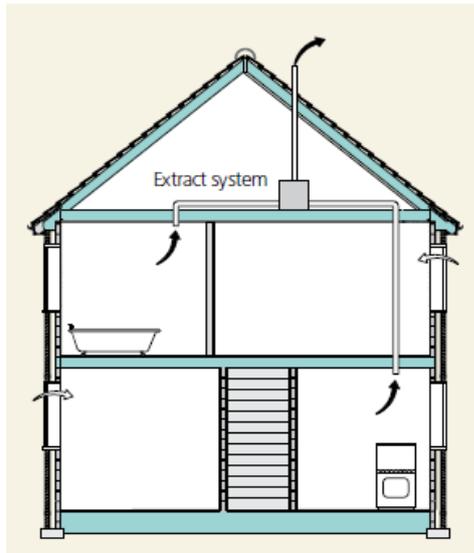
Mechanical Extract Ventilation (Source: GPG268)
